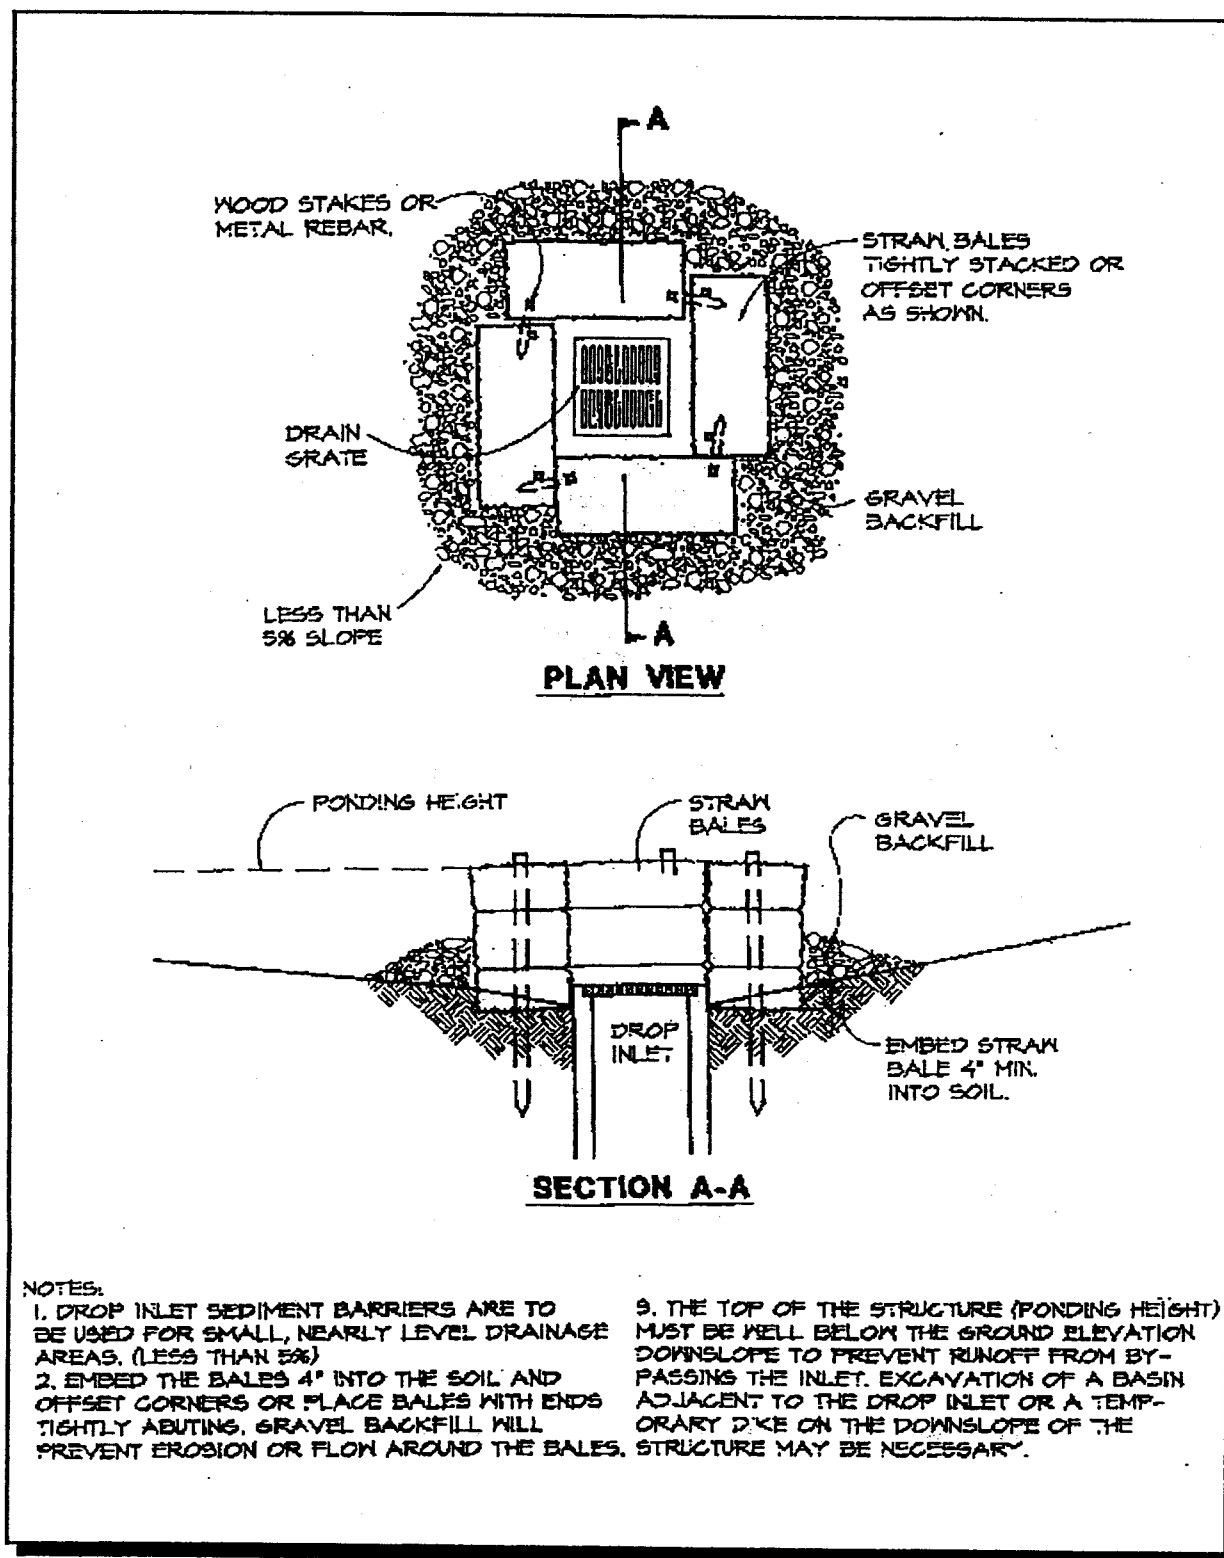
Straw Bale and Gravel Drop Inlet Sediment Barrier
